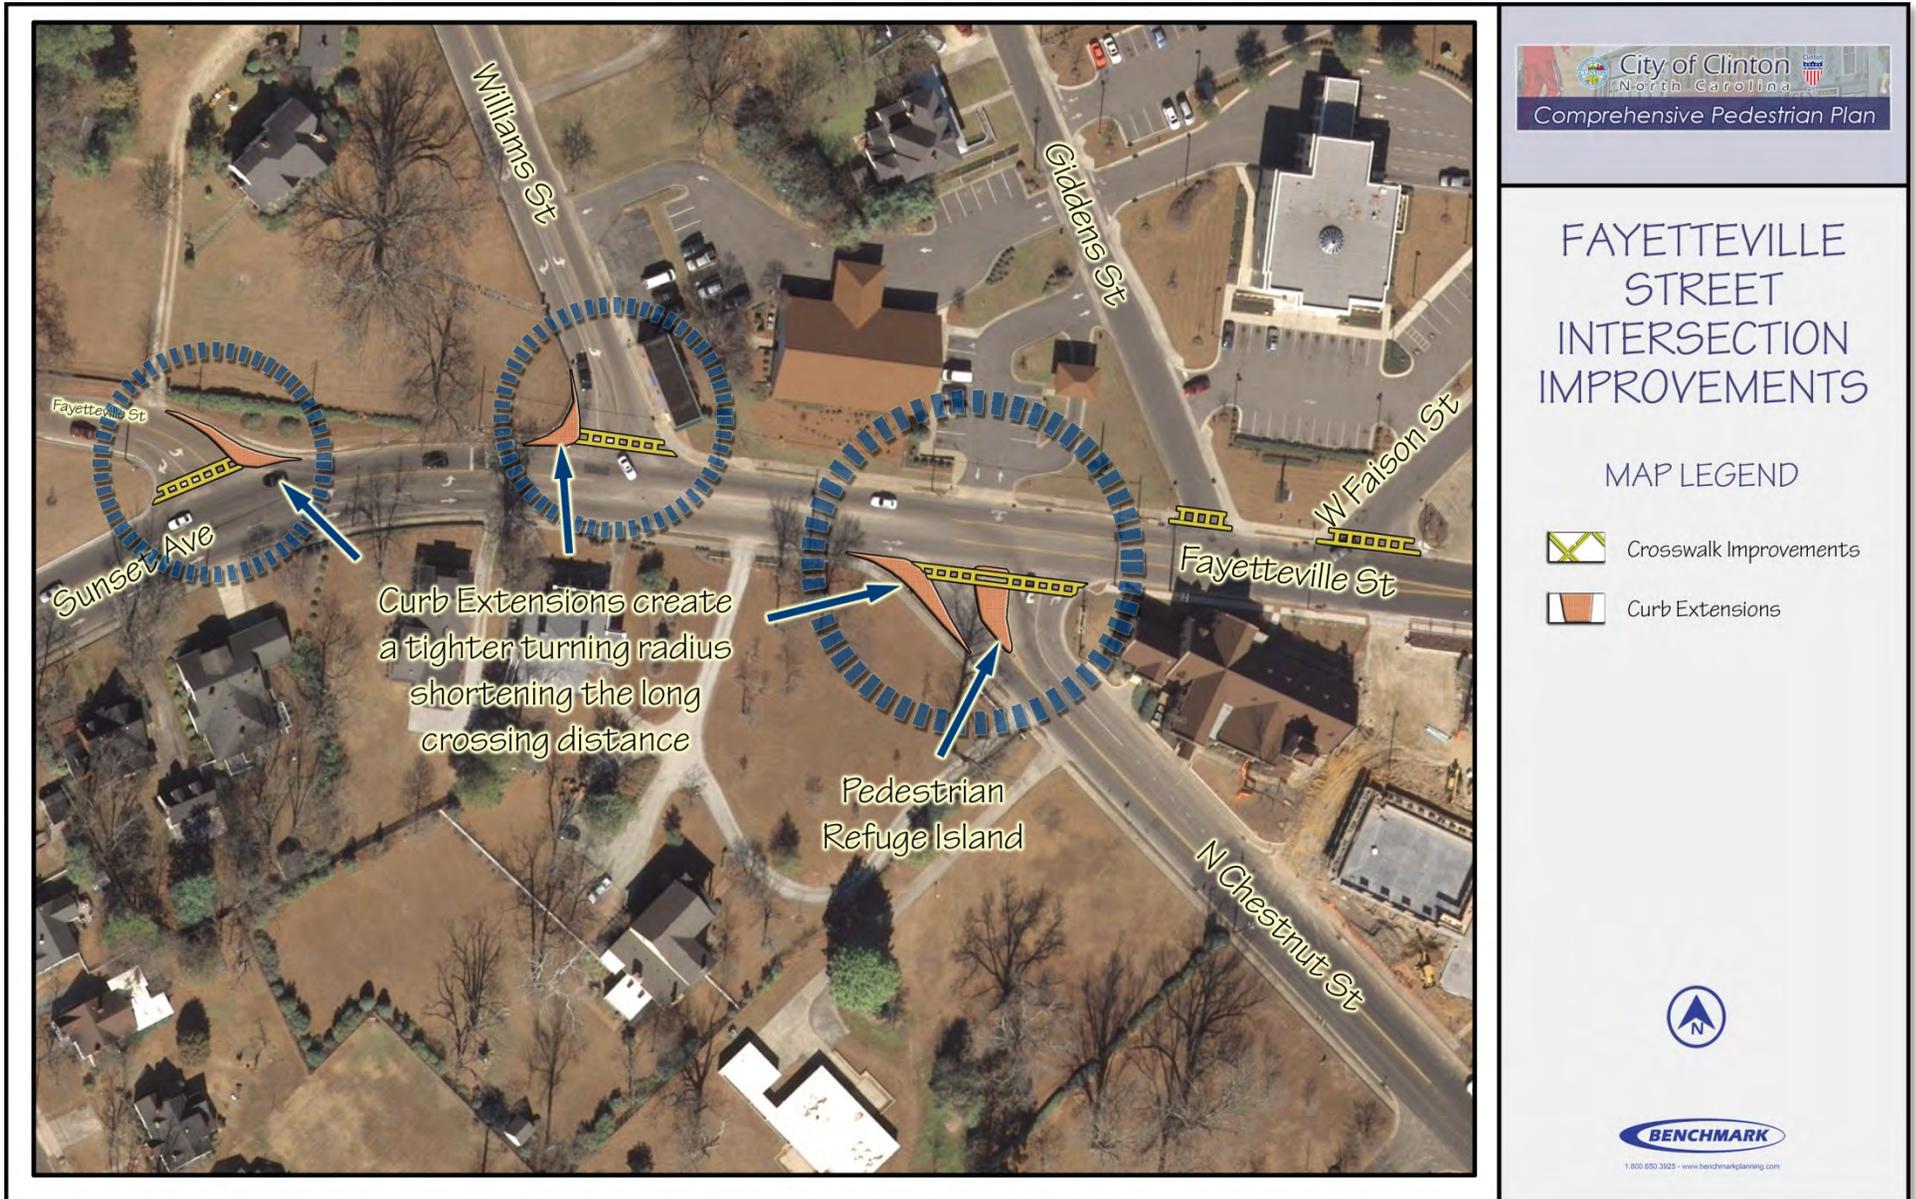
Fayetteville Street from Sunset Avenue to West Faison Street Intersection Improvements
